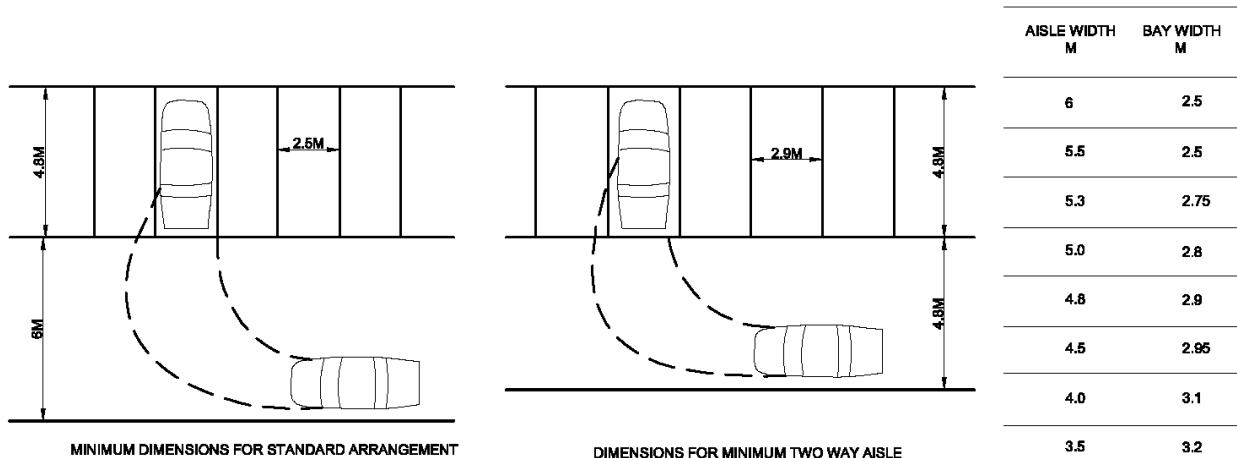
Layout and Aisle Width of a Standard Right Angle Parking Bay
